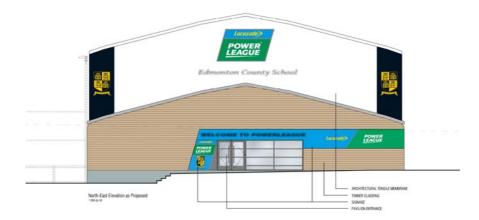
Pavilion Building as viewed from entrance (single storey element to front clad in timber)
